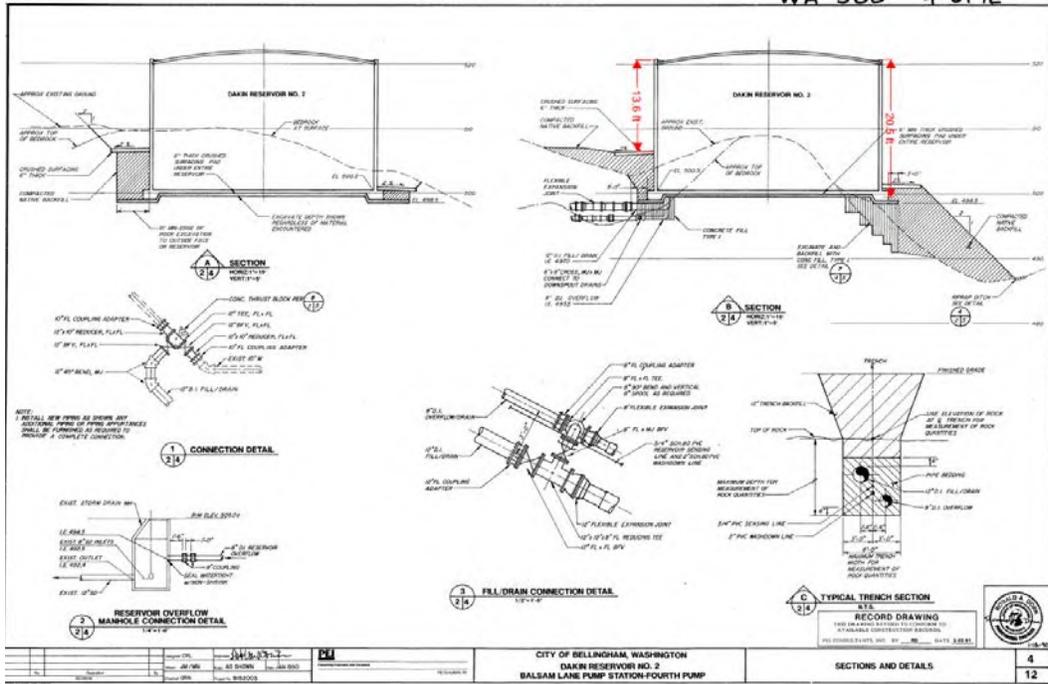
Dakin 2 – Section and Details, Sheet 4
